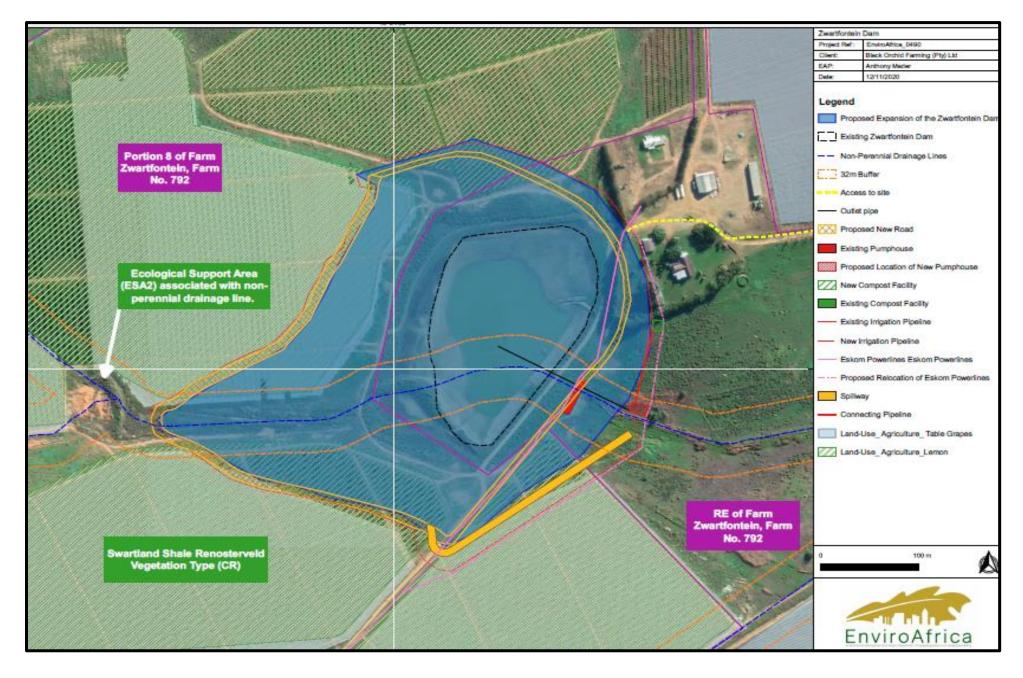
Spatial Development Plan of the proposed Expansion of the Zwartfontein Dam. QGIS, version 3.3.
